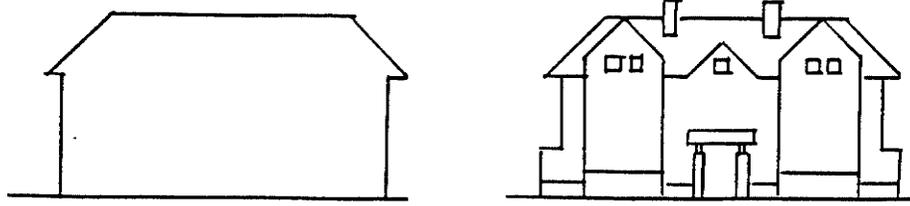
Schematic elevation sketches of two multi-storied buildings with equal heights and widths. Architectural details such as porches, windows, and roof dormers articulate a building's façade (right) which enhances visual quality and contributes to a human-scaled development.
